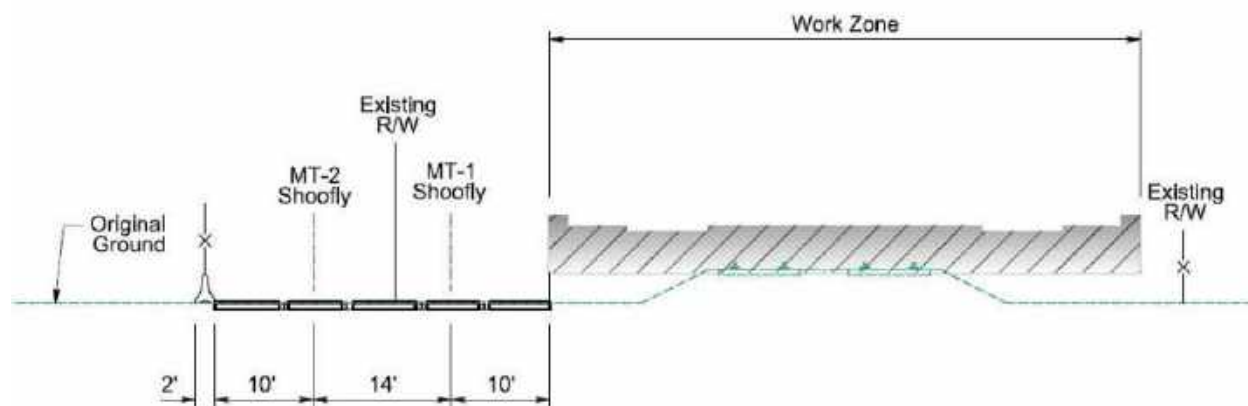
Typical Section of Shoofly Tracks (Looking North)
